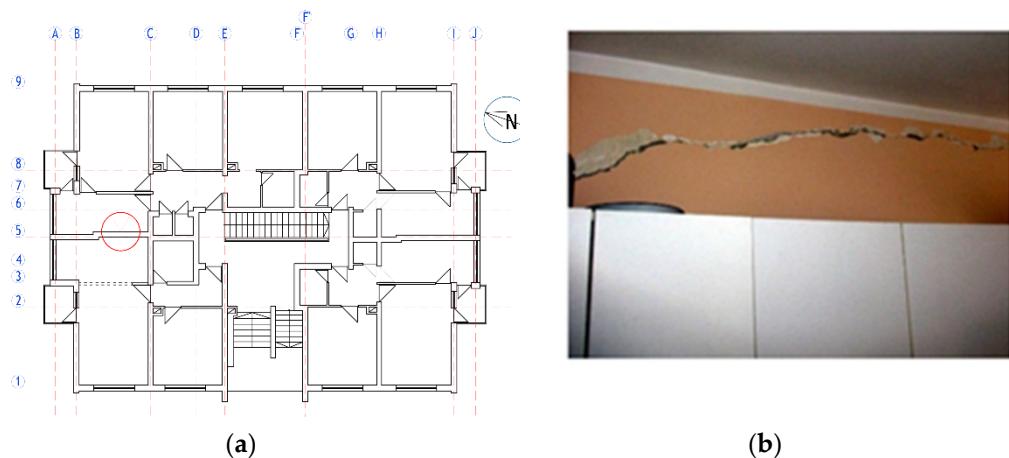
Example of earthquake damage in a case study building: (a) floor plan at the second-story level showing a damaged wall (red arrow) and (b) severe cracking in a longitudinal wall (gridline 5).
